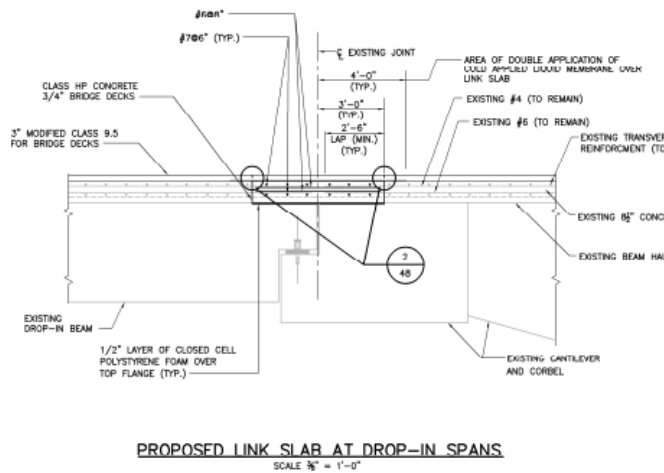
Link Slab Detail, Sheet 45, RIDOT Contract 2016-CB-059, 2016.
